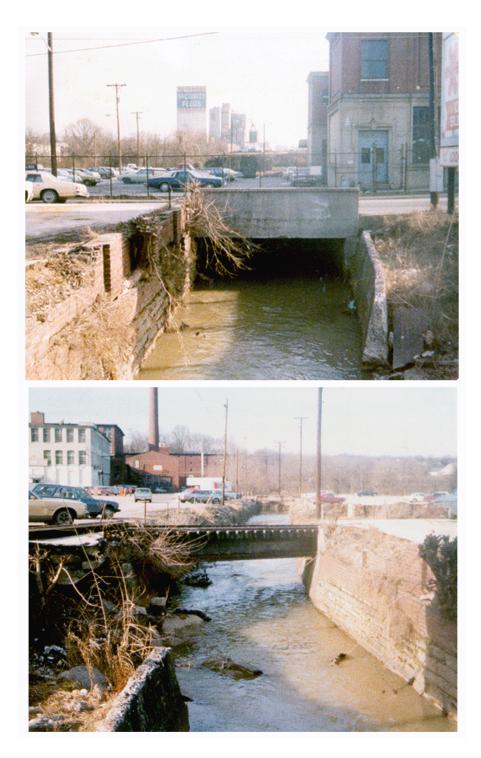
Brick and concrete walls upstream from Baxter Avenue. Even in 1979, at the time of these photographs, parts of the walls were falling into the creek. More damage had occurred by 2001. *Top*: Looking downstream at the culvert under Baxter Avenue. *Bottom*: Looking upstream from Baxter Avenue. (Photographs by the author.)
